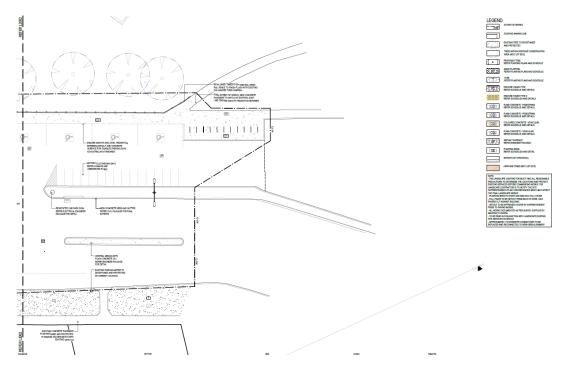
Extract of General Arrangement Sheet 3, showing the extent of the proposed works (Source: Group GSA, General Arrangement Sheet 3, L2003 F 19/10/2018).
